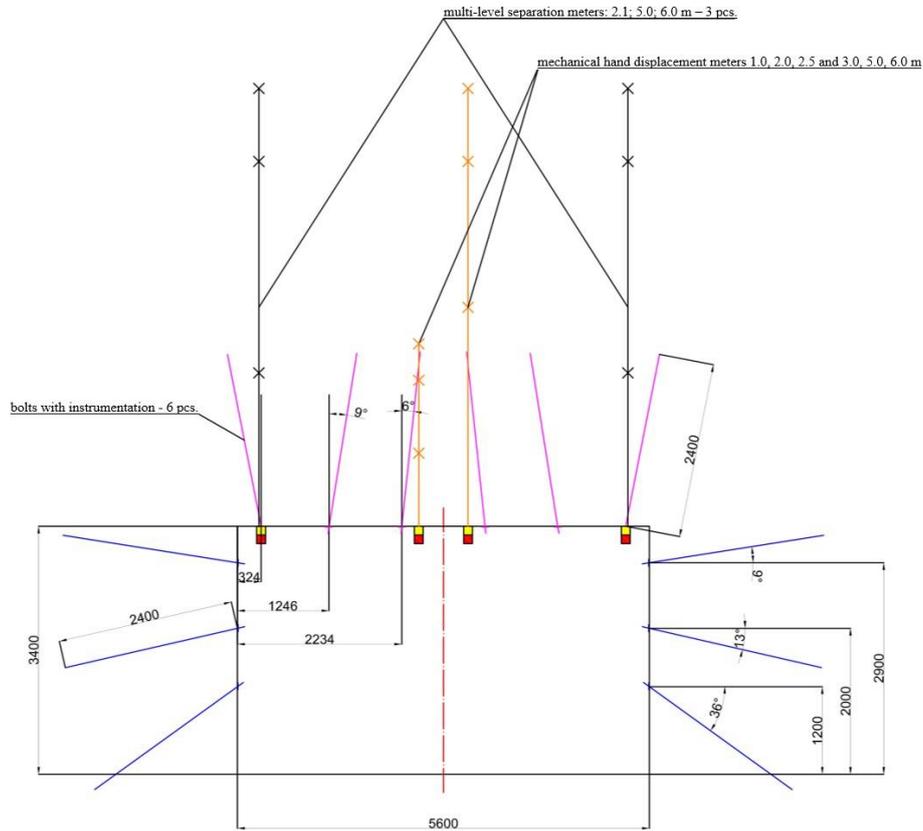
Scheme of a periodical control station – station No. 3 – vertical section
